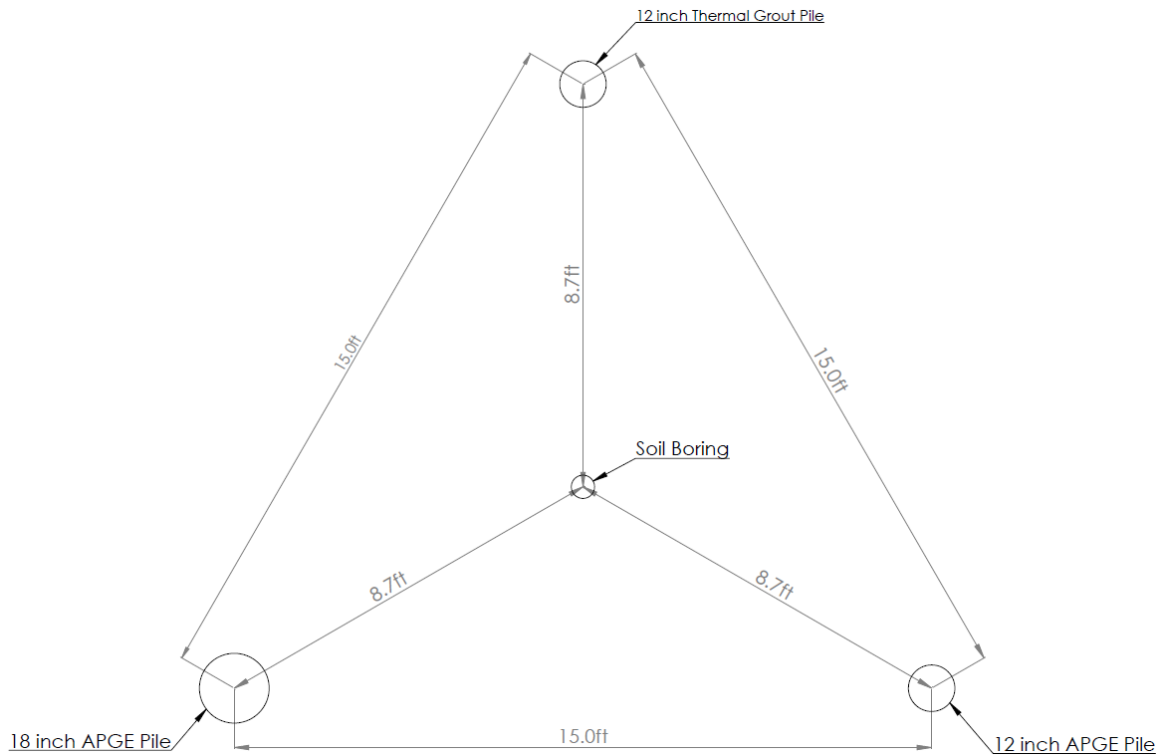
The layout of the experimental test site including the three piles and soil boring locations.
